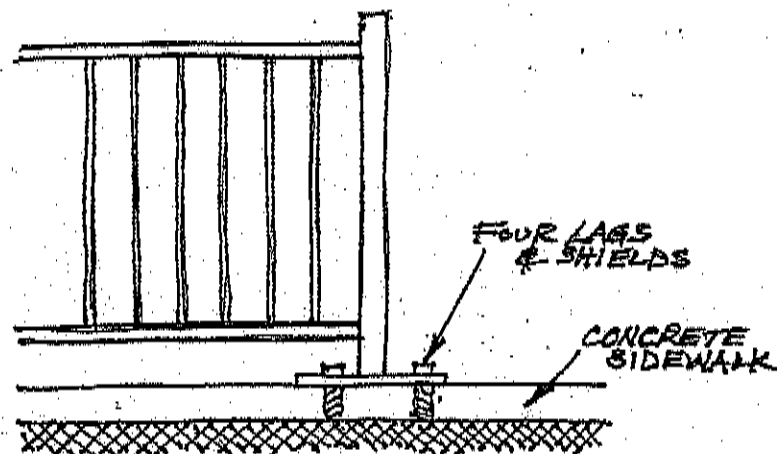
D) - Anchoring fencing into concrete sidewalks
